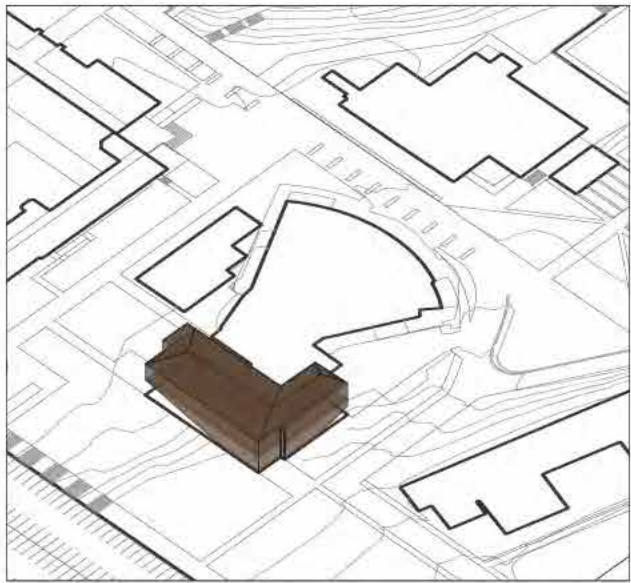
Axonometric and Site Plan of new music building as a Landis addition
